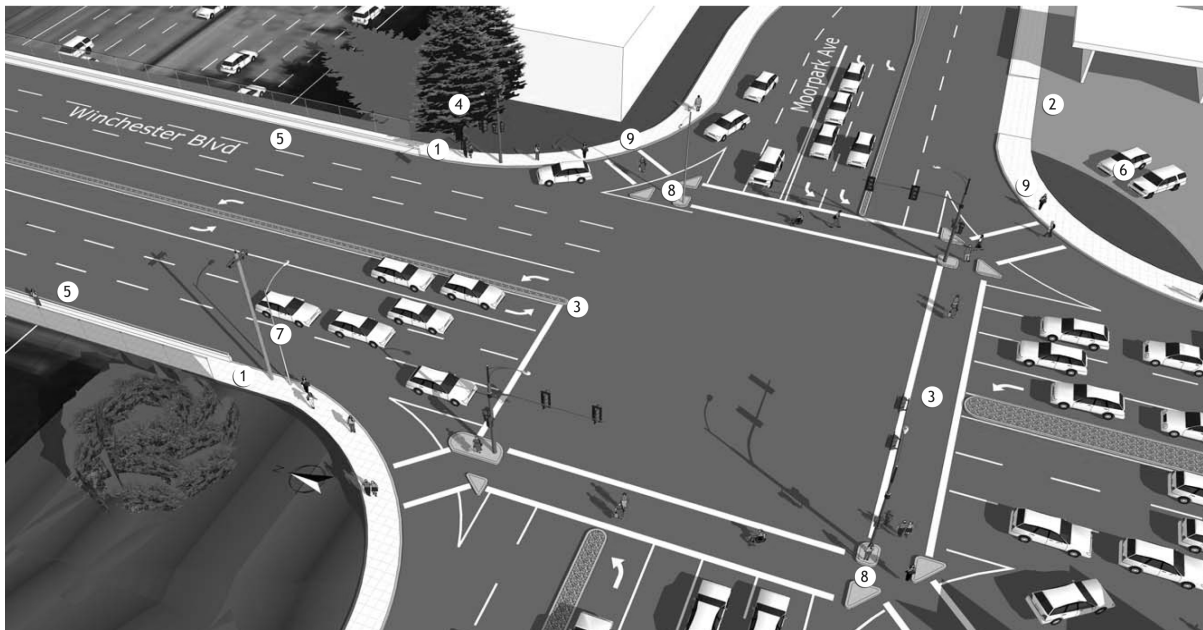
WINCHESTER BOULEVARD/I-280 BRIDGE - EXISTING
